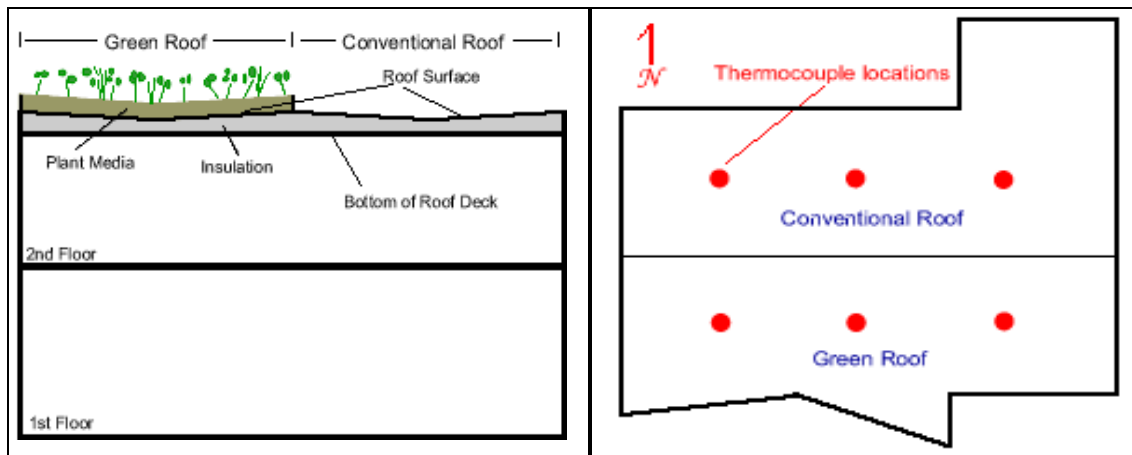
Roof diagram with sensor locations. Figure 24. Building section diagram.
